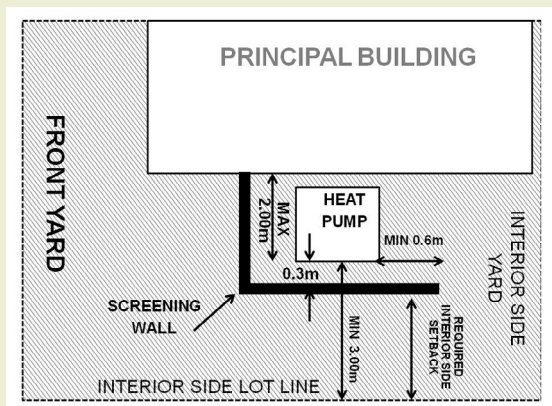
Town of Comox Zoning Bylaw Figure 5-3. Site Plan view of Heat Pump side yard screening
